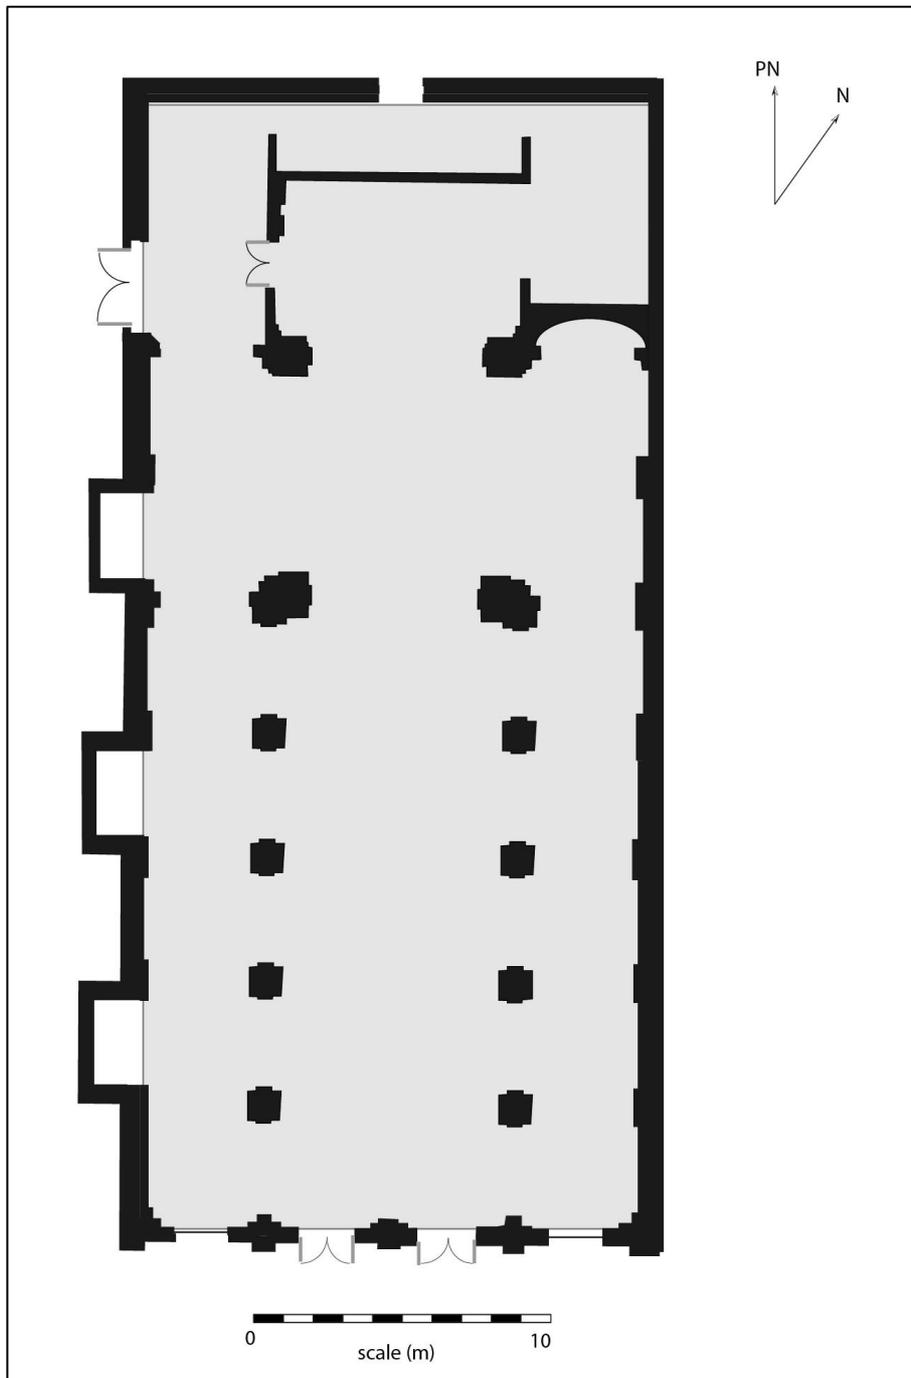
Floor plan of the St Paul's basilica. The grey shading represents the excavated area.
